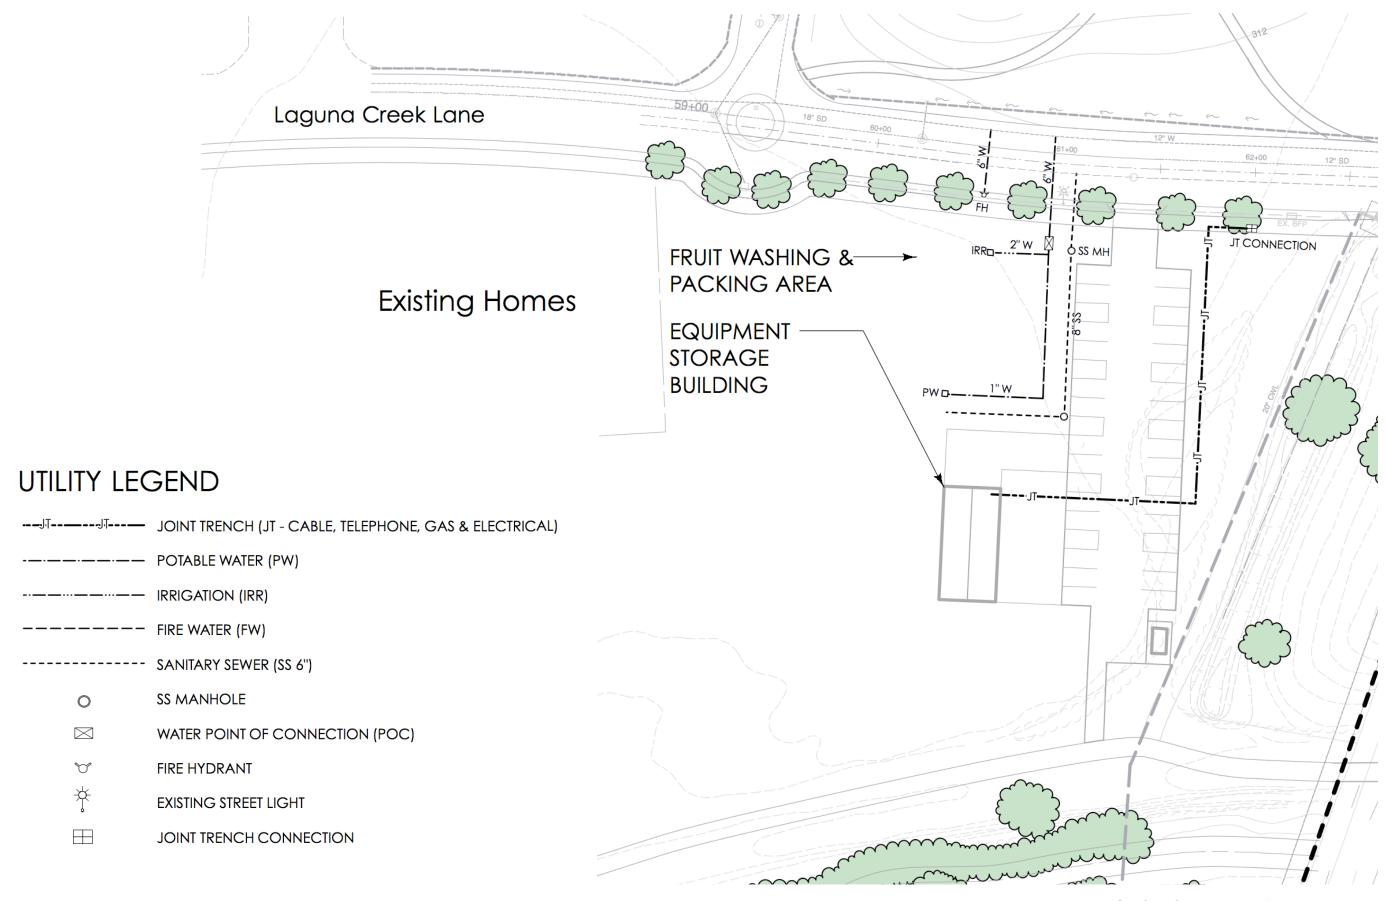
SUB-AREA 16 - UTILITY PLAN
